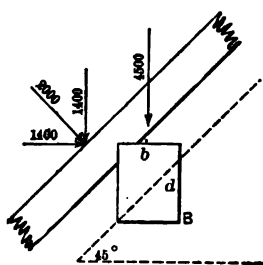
A. Purlin-design for Joint 2 of Truss Shown in Fig. 1
